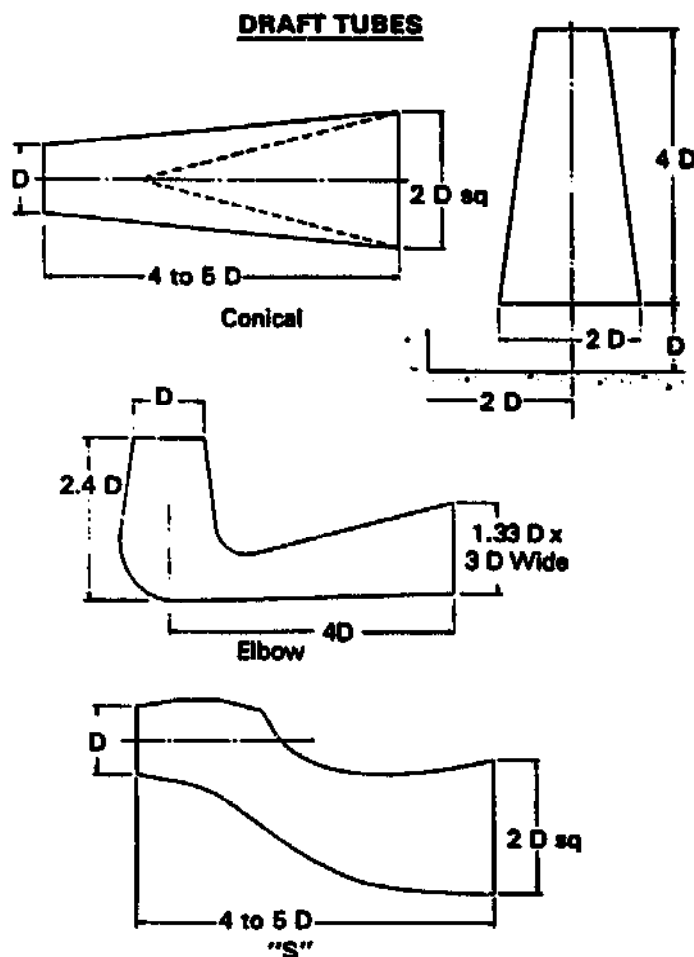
Typical draft tube dimensions (Mayo, 1979)
